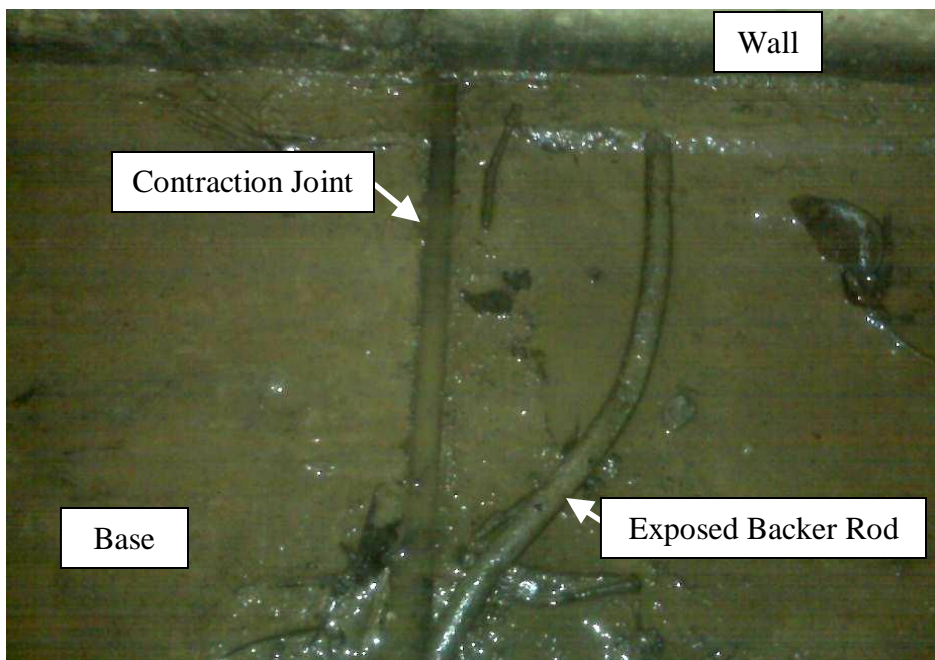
Transverse Contraction Joint in the Base of Corridor X Culvert at 4877+13 at Station 151 ft 8 in.
